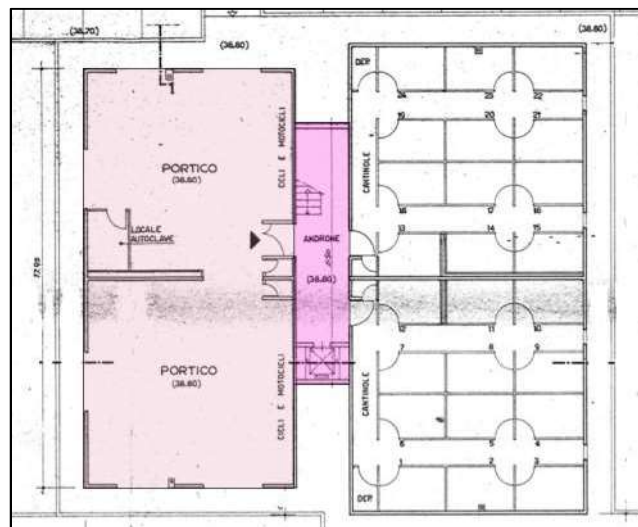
Ground floor plant with the identification of the porches and stairwells.
